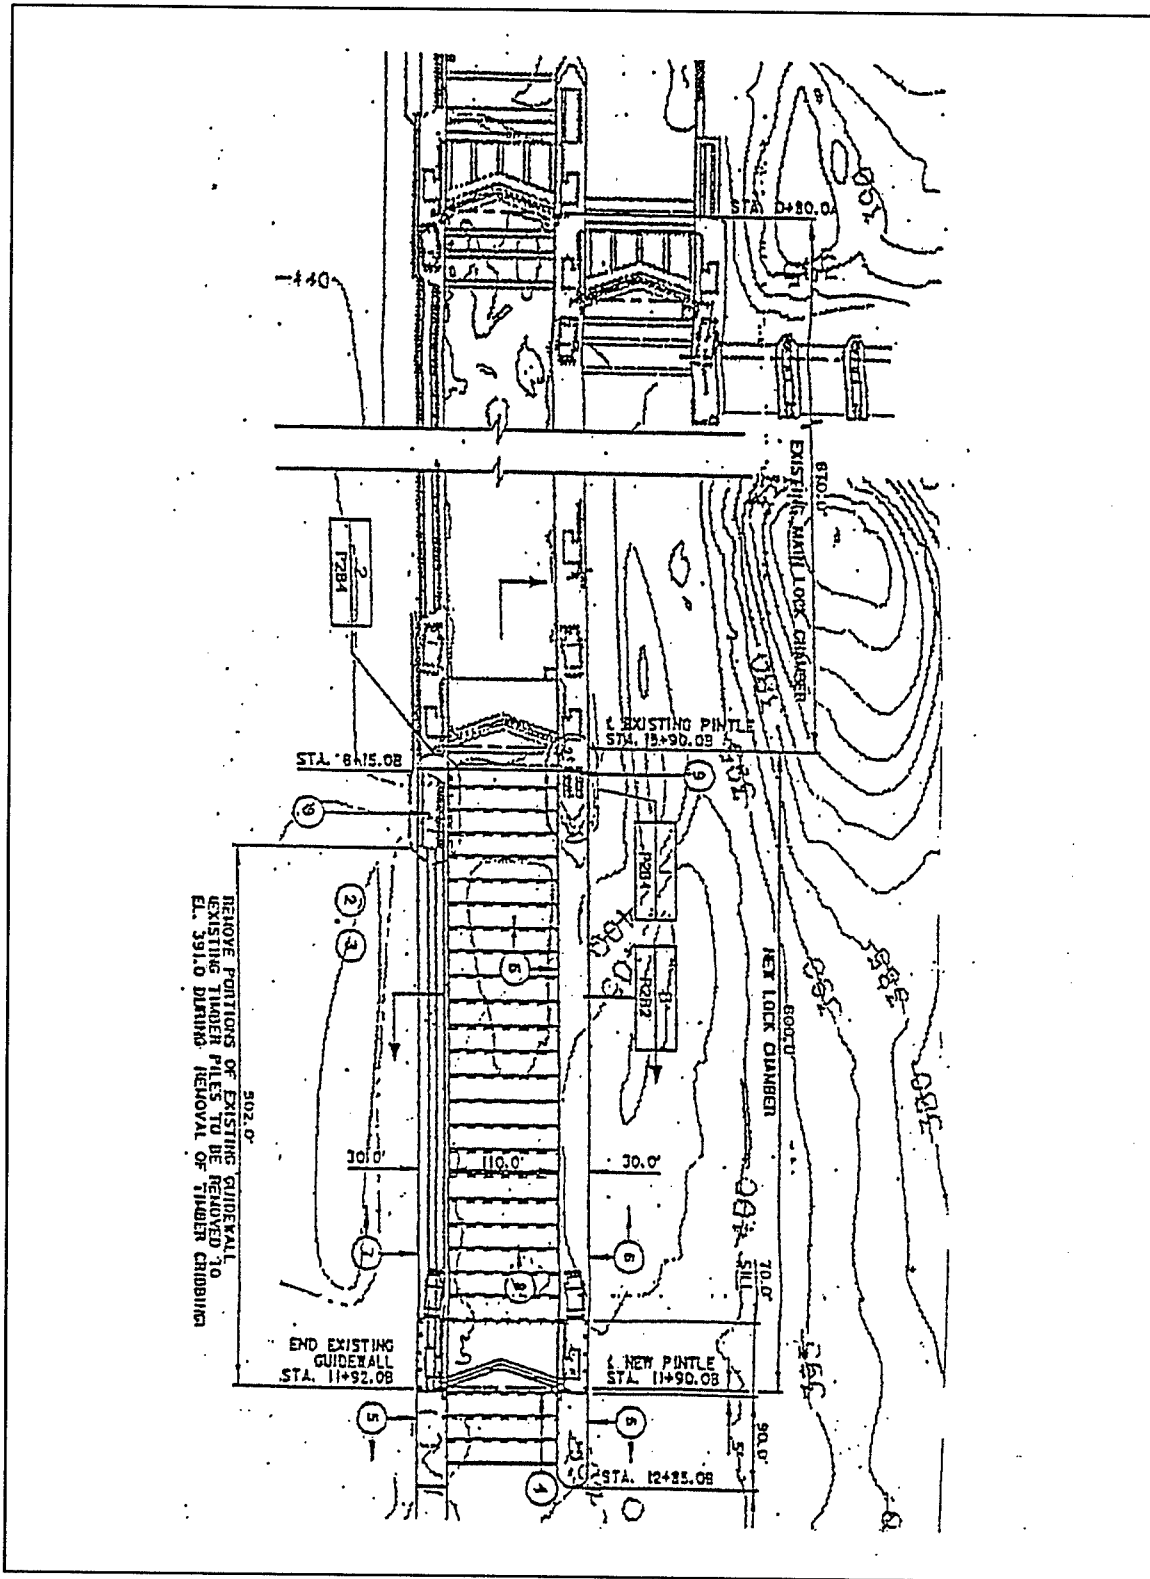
Plan 2, plan view of 600-ft lock extension, structural lock floor
